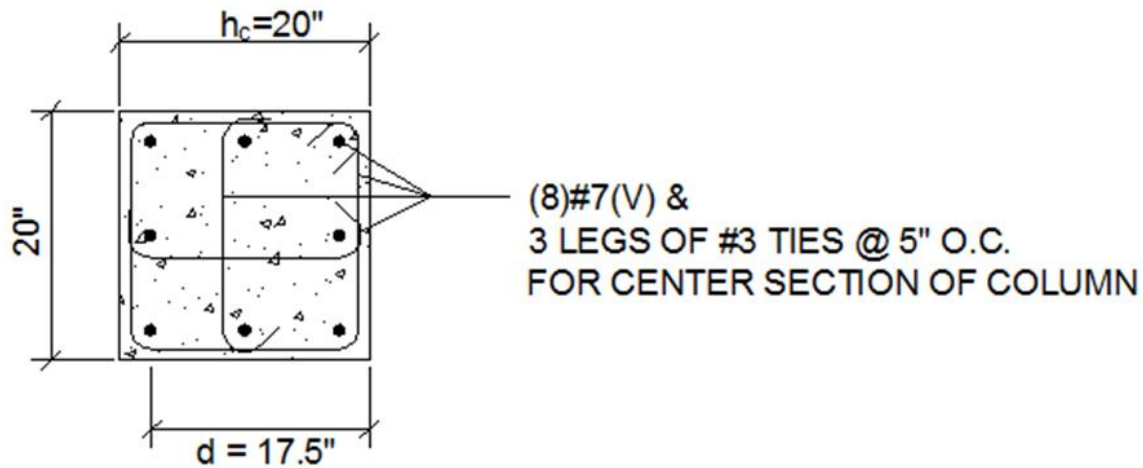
Exterior column, cross-section at center of column at all floor levels based on SDC D design.
